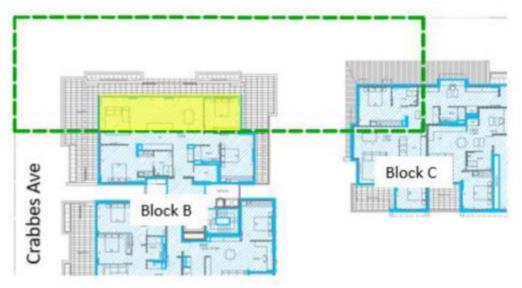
Extract of GFA Plan showing extent of contravention in yellow (Source: Hyecorp/Amglen)
